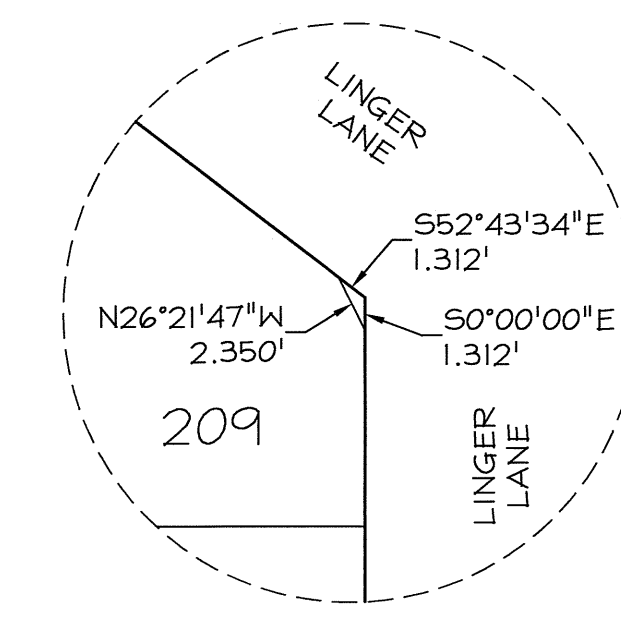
DETAIL "A" - SIDEWALK EASEMENTS FOR HANDICAP
